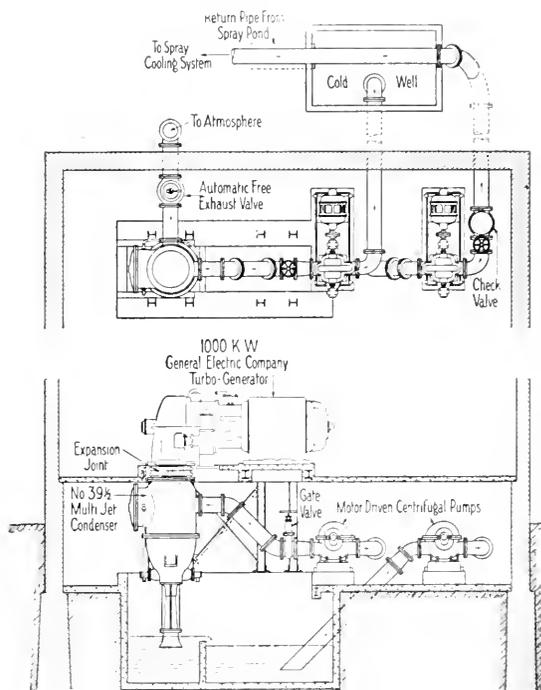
Plan and Elevation of Jet Condenser Connected to a General Electric 1000-kw. Turbine-generator; Municipal Electric Light Plant, Lansdale, Pa.
